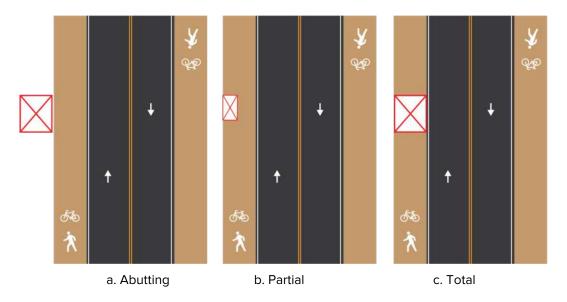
Types of obstructions at construction sites – (a) abutting, (b) partial and (c) total obstructions.
